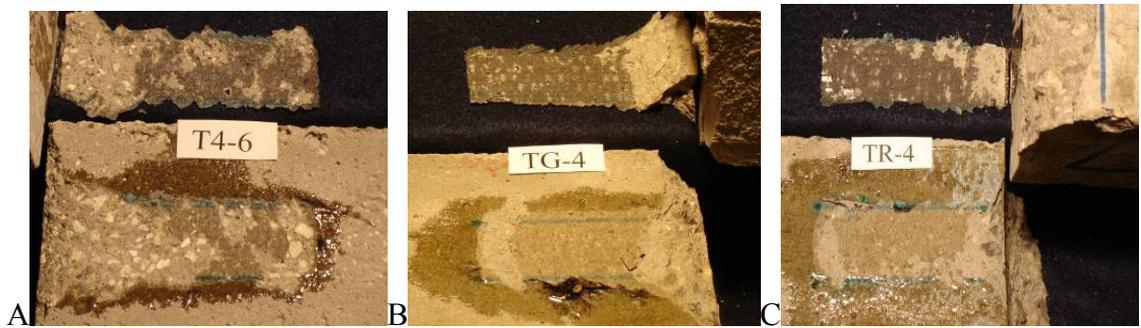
Failed specimens with (B and C) and without (A) additional tensile reinforcement.
